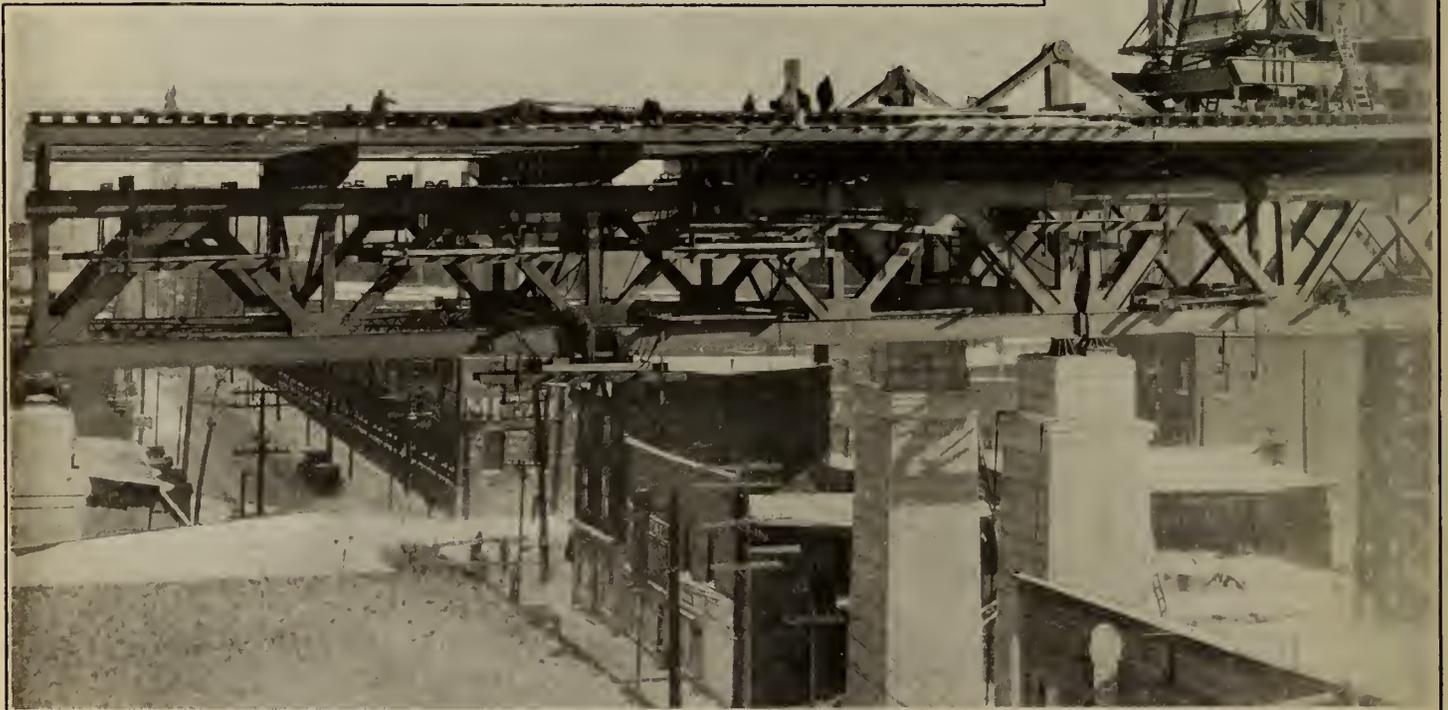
North Approach—Cantilever Erection of Span over St. Catherine Street.
